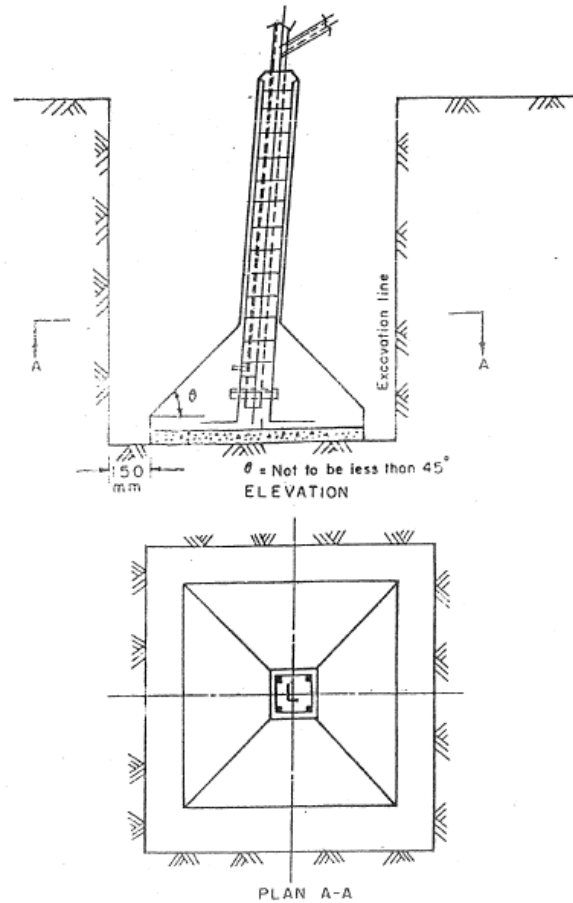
Pyramid Chimney Type Foundation (P.C.C.)
